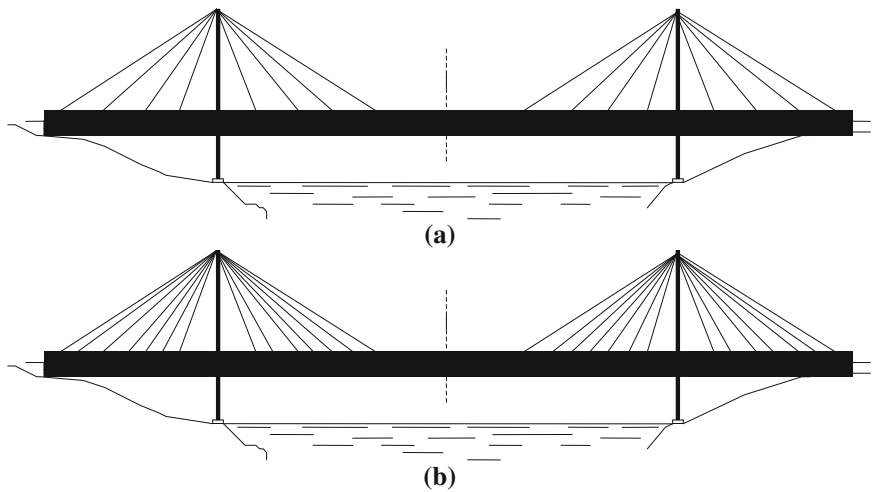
a Cable-stay bridge with several cables. b Cable-stay bridge with cable separation reduced
